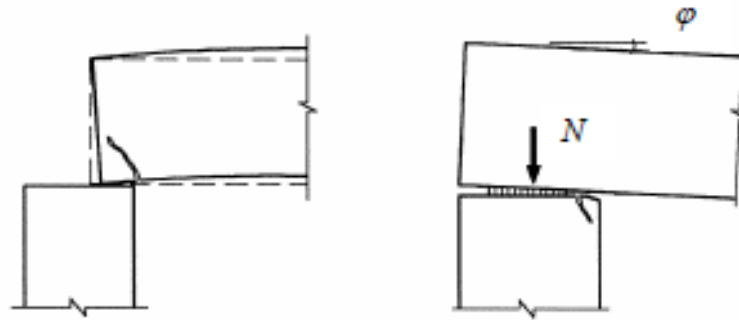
Damage of a beam column connection caused by beam deformation (FIB, 2008, p. 41)
